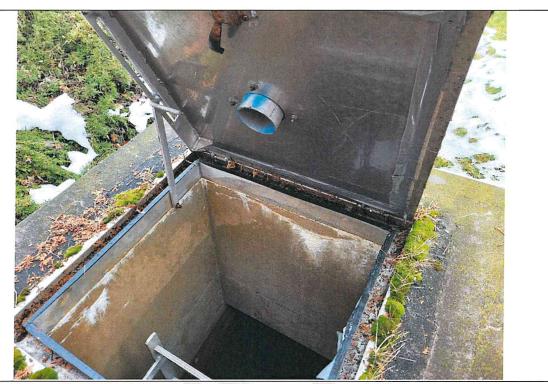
Reservoir Access Chimney. Cracking w/ Efflorescence
